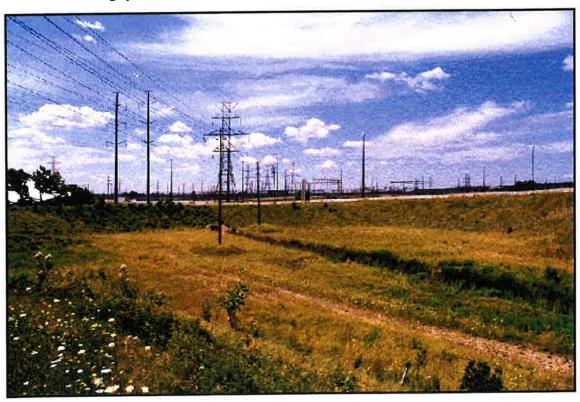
Looking downstream from the berm on the south side of the Freeman Pond.
